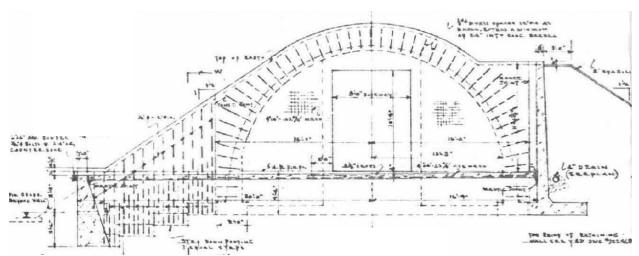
CF-638 cross section, 1943 (U.S. Naval Proving Ground 1943)
